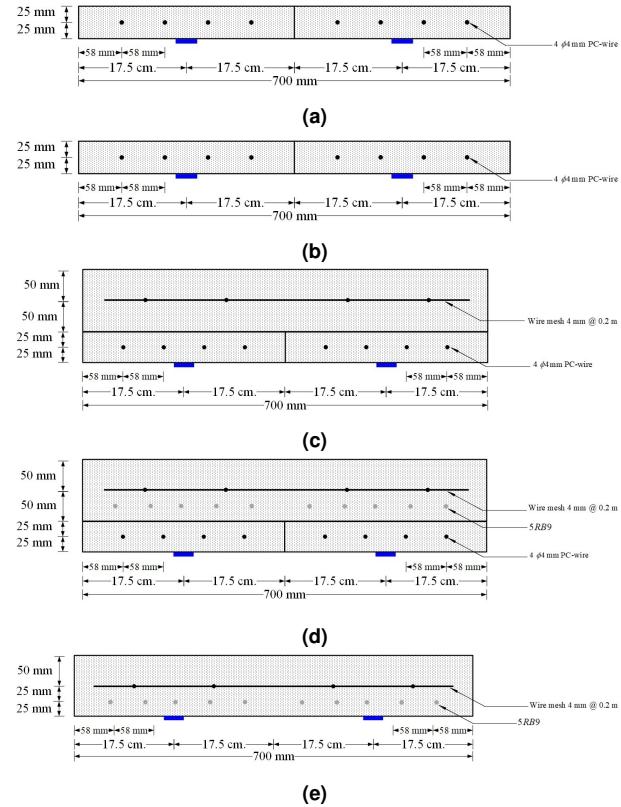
Detailed cross-sectional configurations of the tested slabs: (a) Control slab PC; (b) Slab with 50 mm overlay PC-C5; (c) Slab with 100 mm overlay PC-C10; (d) Slab with reinforced 100 mm overlay PC-RC10.
